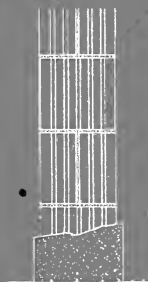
DETAIL OF HOLLOW TILE PIERS WITH STVCCO COVERING
